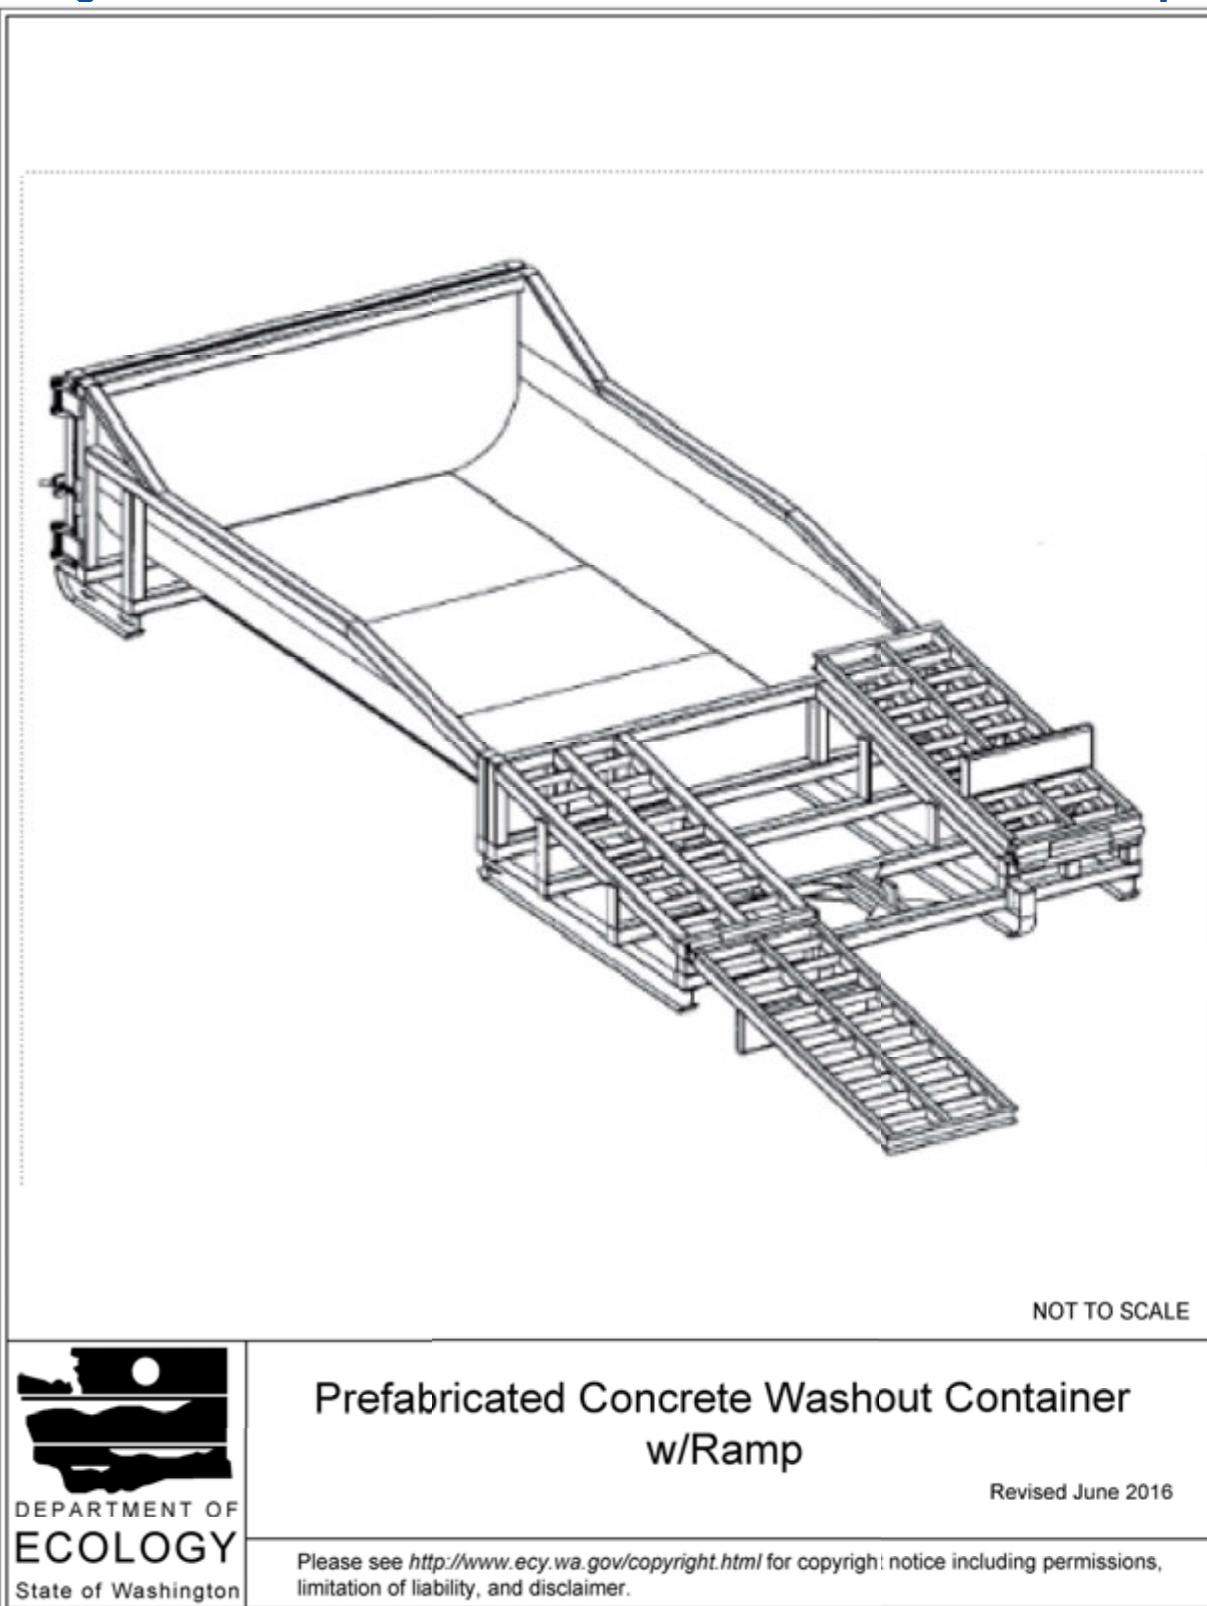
Prefabricated Concrete Washout Container w/Ramp
